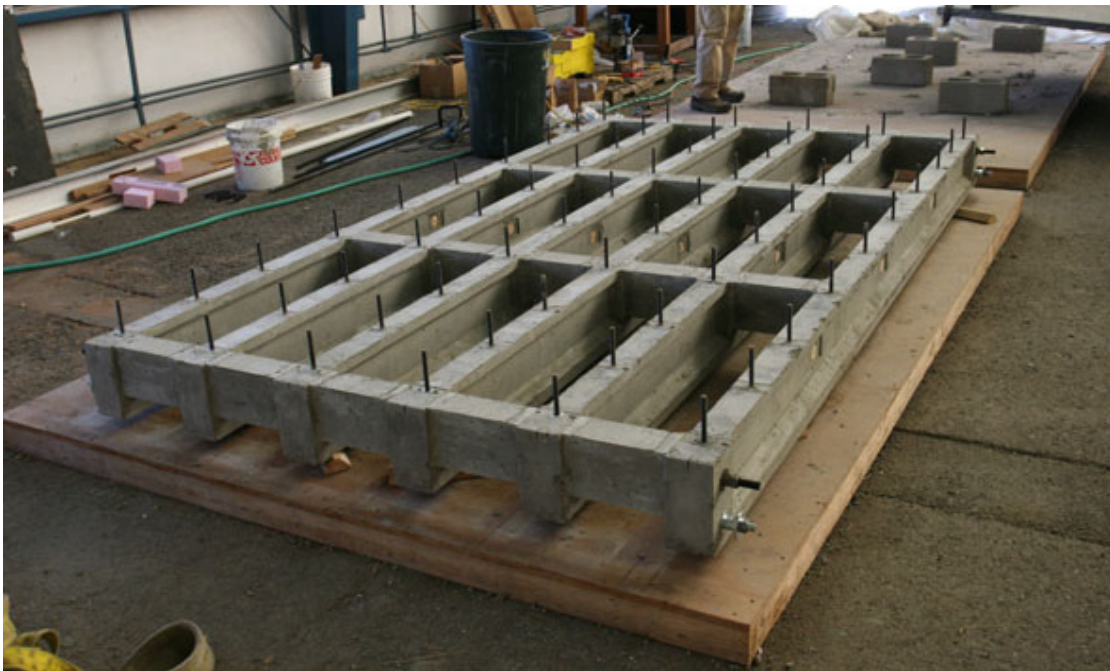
Precast bridge specimen prior to attachment of deck.
